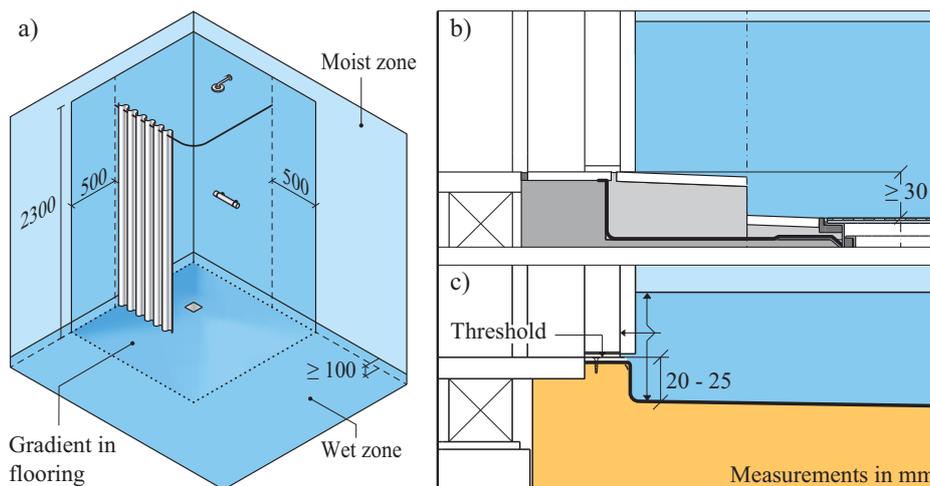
a) Moist and wet zone in a bathroom with a shower unit, where wet zone encompasses the entire floor and walls around the shower unit until 500 mm from its demarcation. Wet zone on walls are from floor to ceiling, however in tall rooms the area above normal room height can be considered as moist zone. No penetration of pipes is allowed in the area with a gradient in the flooring. A basin is required i.e. b) 30 mm height difference between the top of the drain and the floor at the door or alternatively c) 20 mm between top of floor and lower edge of threshold [Brandt 2001].
